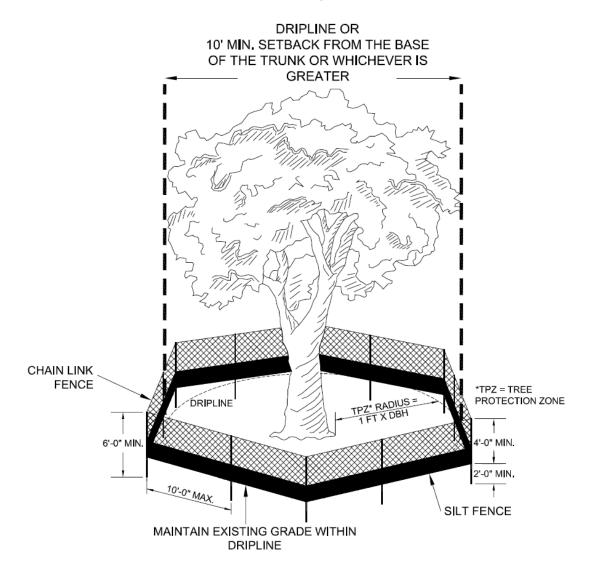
REGULATED TREE BARRICADE DETAIL
